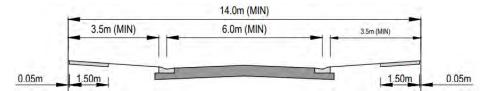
Typical Road Profile, Access Place (Local Government Infrastructure Design Association, March 2020)
